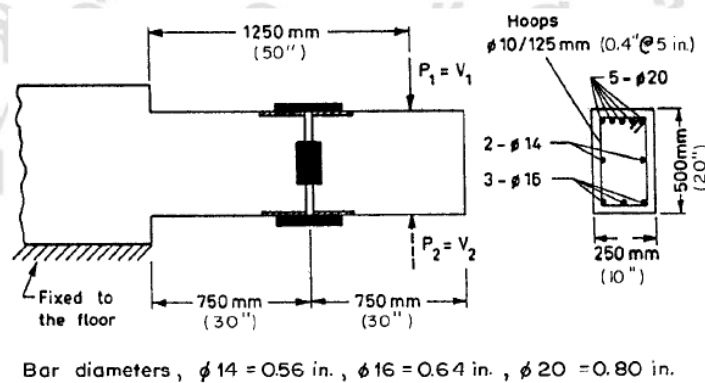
Test specimens of Seckin and Fu (Seckin and Fu, 1990)
